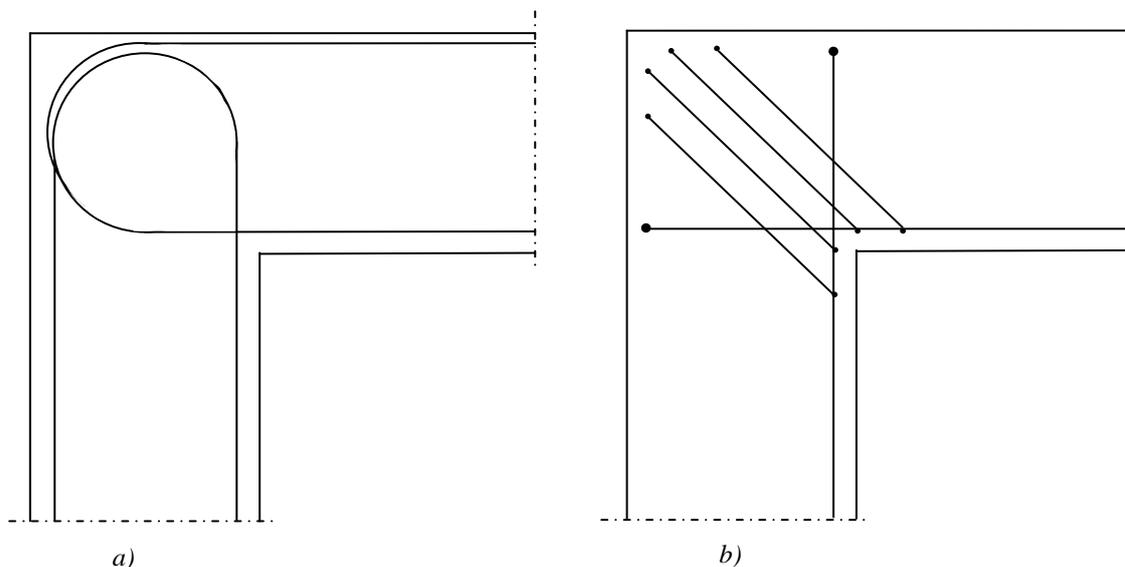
Frame corner with moderate opening moment. a) and b) show alternative arrangement of detailing reinforcement. The figure is based on SIS (2008).
